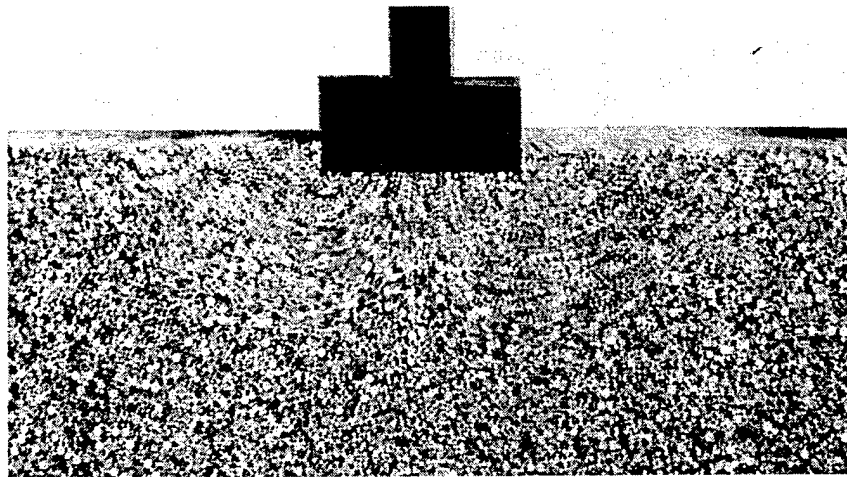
Failure zone under a shallow foundation (Lambe and Whitman, 1979).
